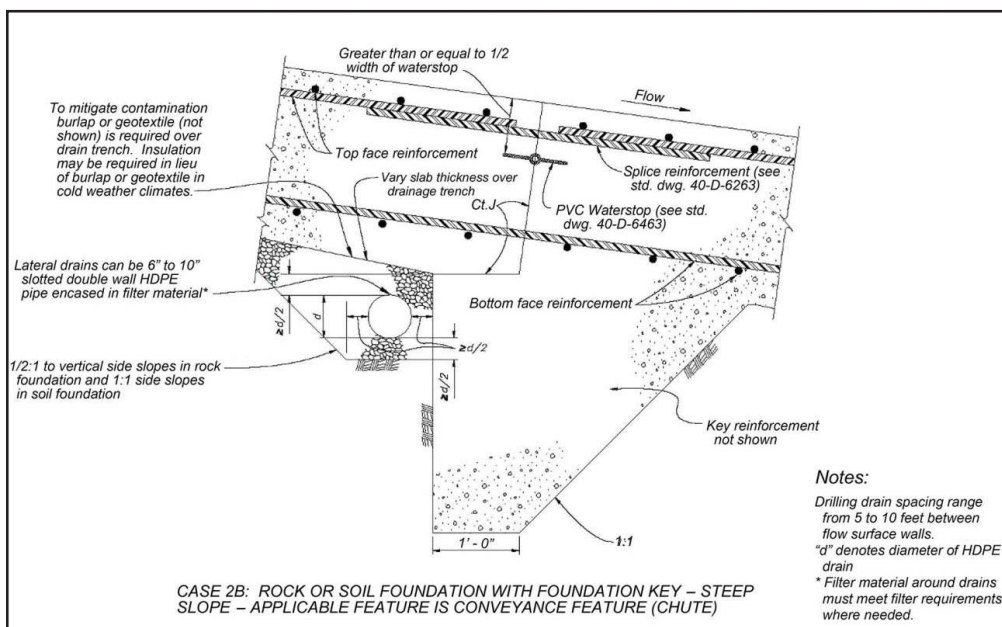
Control Joint Detail (Ref. USBR Design Standard 14, Chapter 3)
